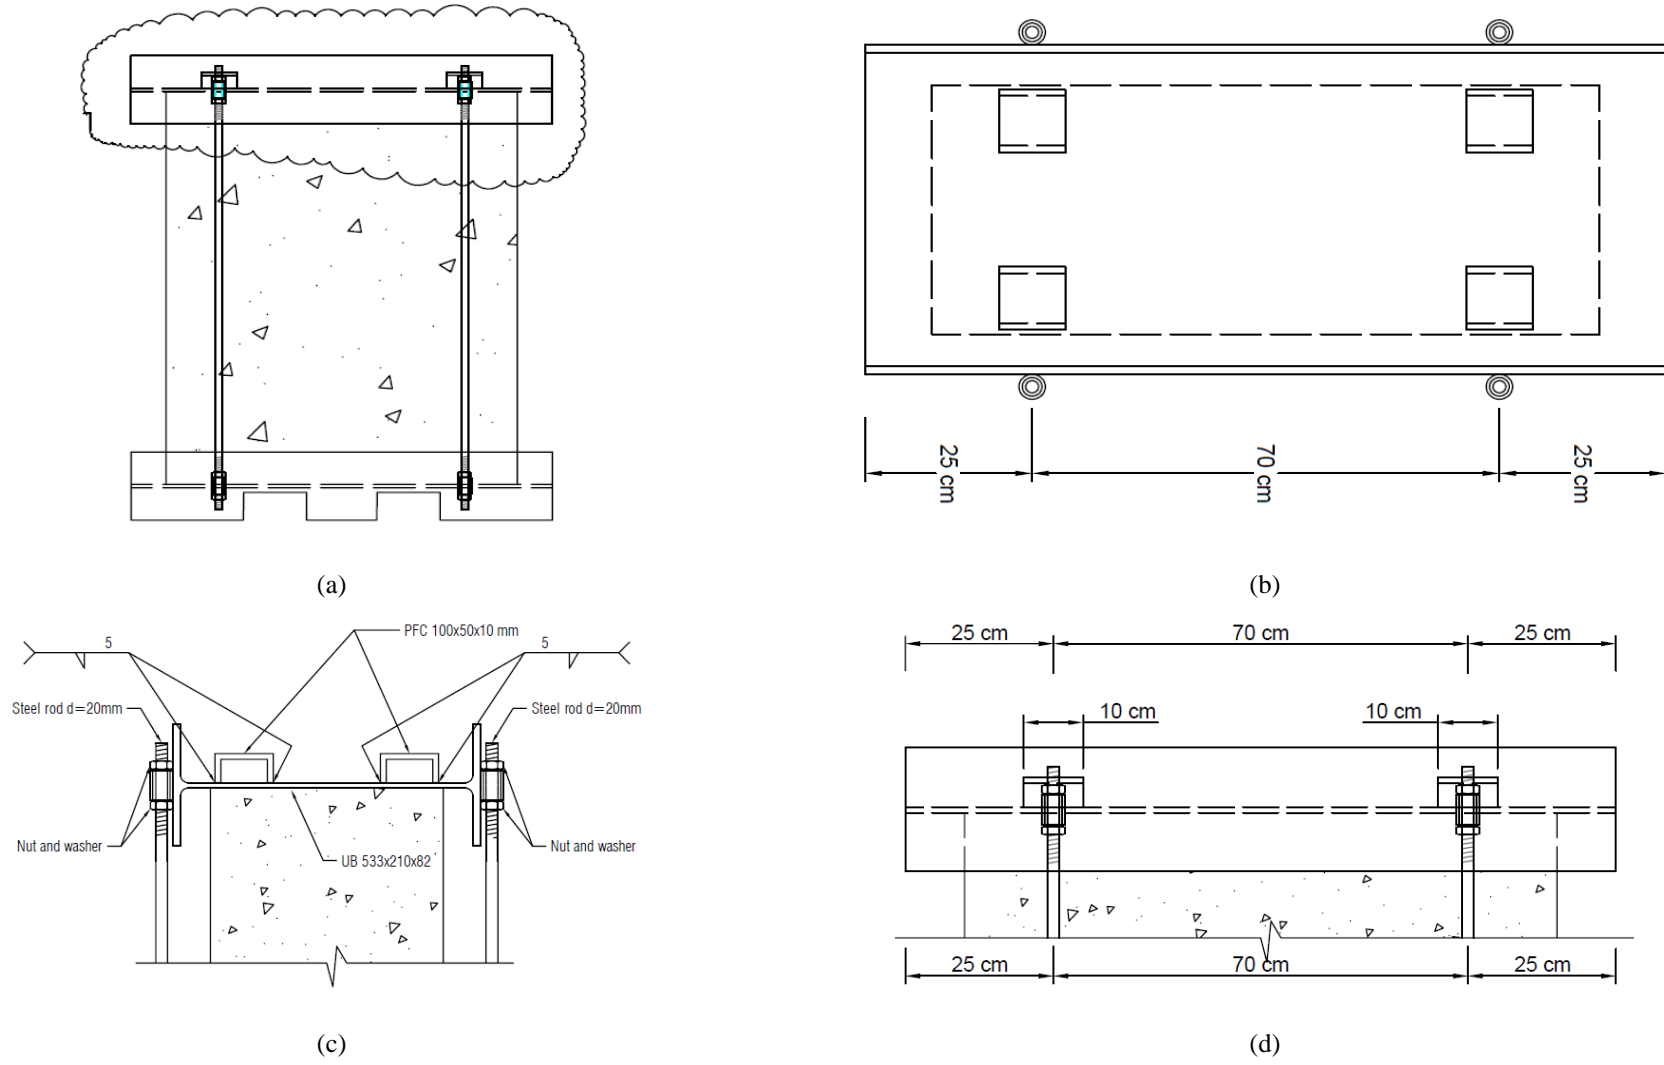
Top cap (a) general sketch, (b) top view, (c) side view and (d) front view.
